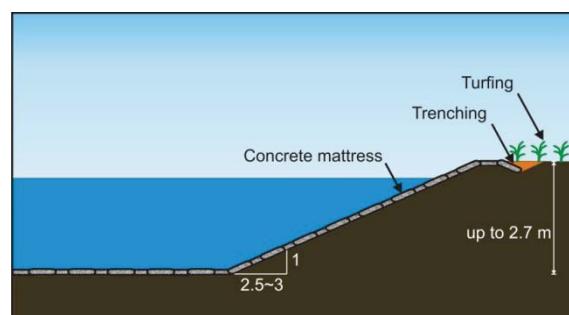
Typical cross section of the channel lined with concrete mattress for the KLIA 2 project
